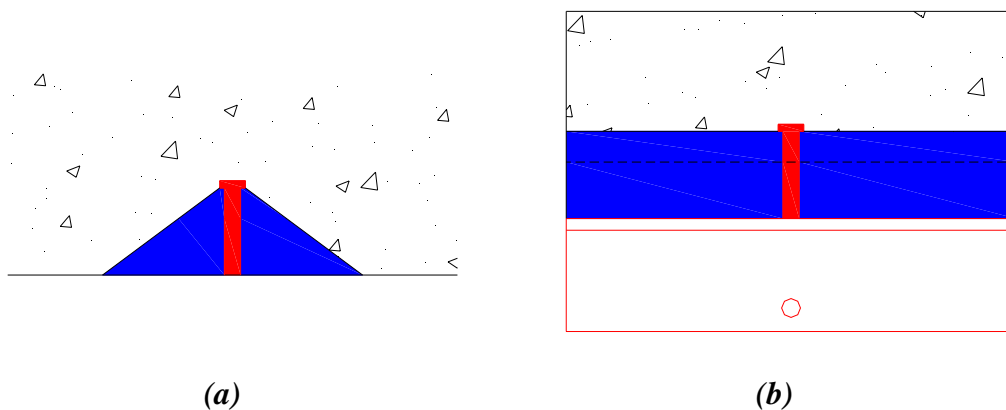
Deck longitudinal direction – (a) assumed breakout failure; (b) actual breakout failure
